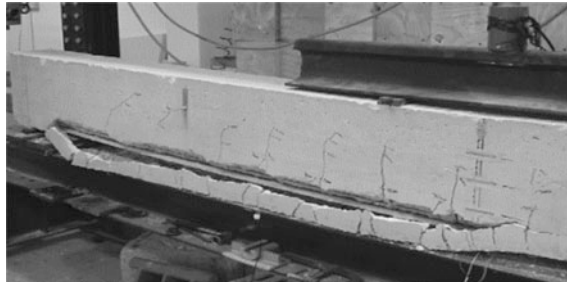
Failure by intermediate crack debonding with adjacent cover concrete (Kotynia 2007a)
